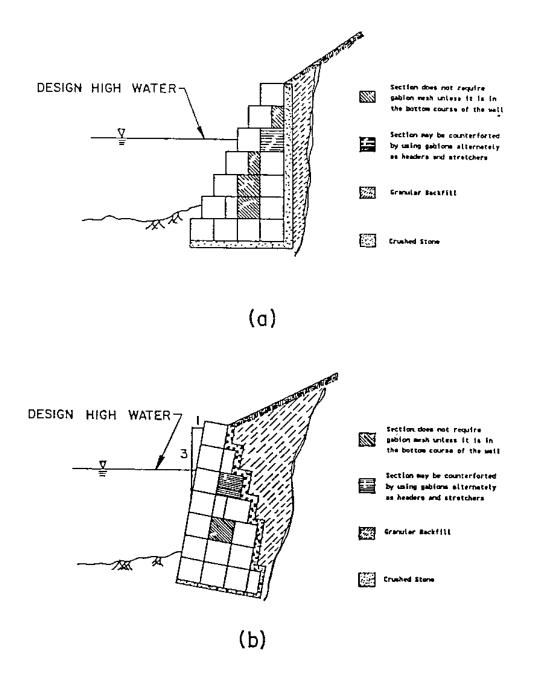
Section Details: (a) stepped back and (b) battered gabion retaining walls
